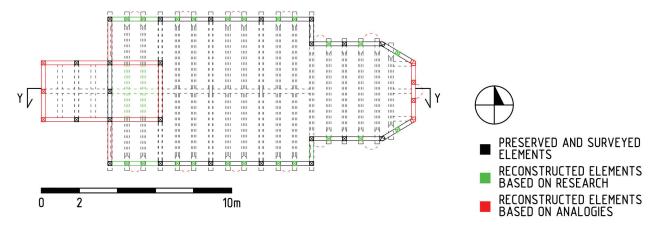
Church of Our Lady of the Rosary in Byków, reconstruction of the original form of the church (16th century), ground floor plan at window level (elaborated by M. Kumorowicz-Brzeska, U. Schaaf, M. Prarat, D. Jagiełło)
